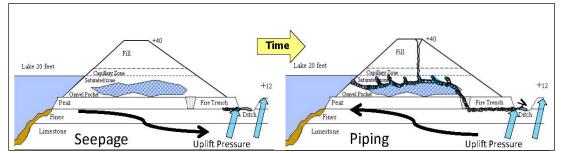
Dike Failure Cross-Section Depicting Seepage and Piping.
